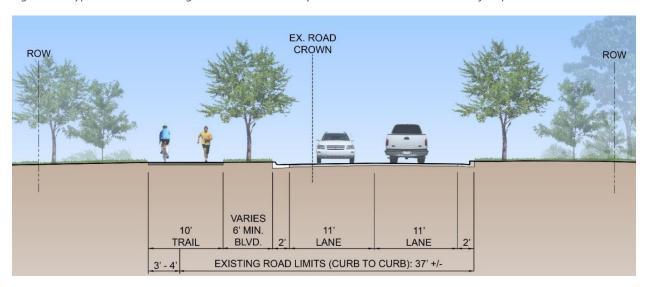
Typical Section H - Edgerton Street to County Road E - Alternative 2: Widening balanced east/west
